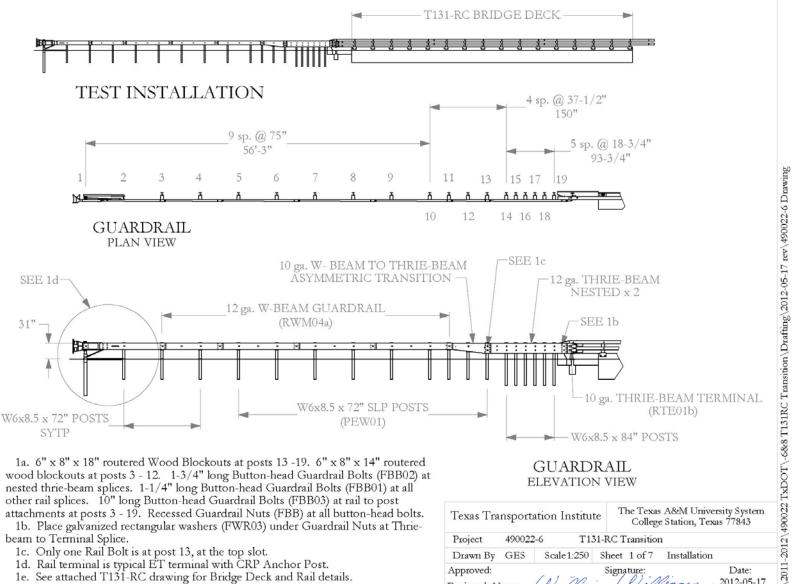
Details of the TxDOT T131RC Bridge Rail Transition Installation.
